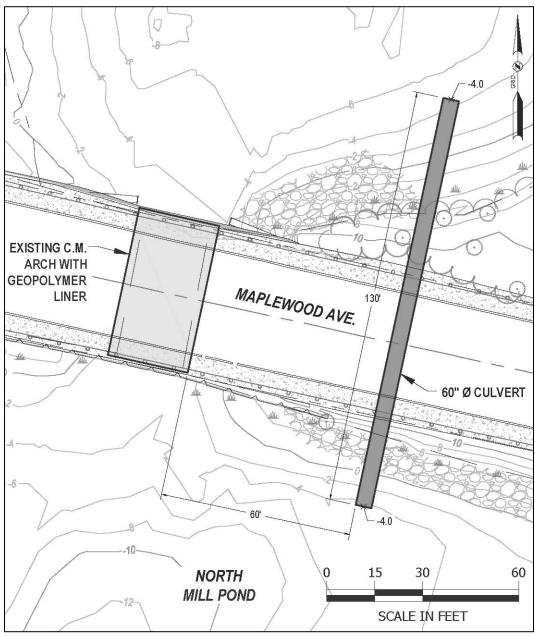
Bridge Rehabilitation Alternative 2.2 schematic plan
